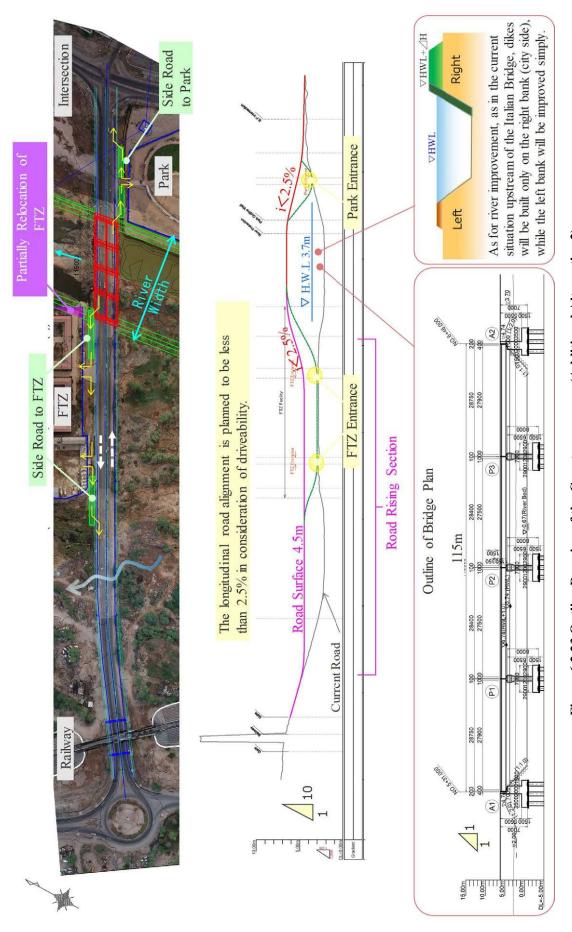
Outline Drawing of the Countermeasures (Additional Alternative 2)
